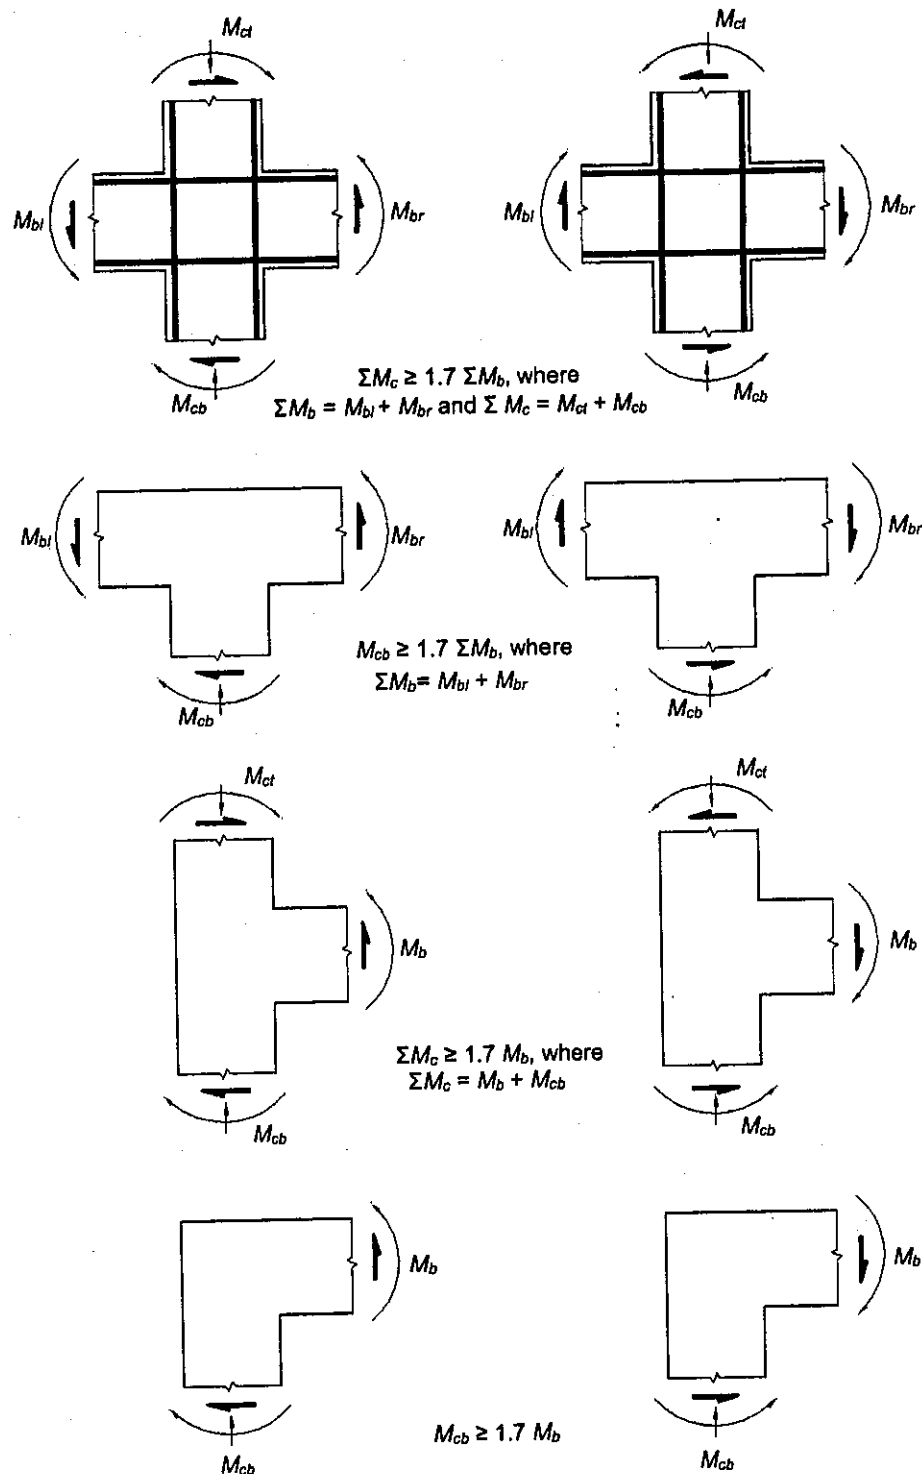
STRONG COLUMN - WEAK BEAM REQUIREMENT
